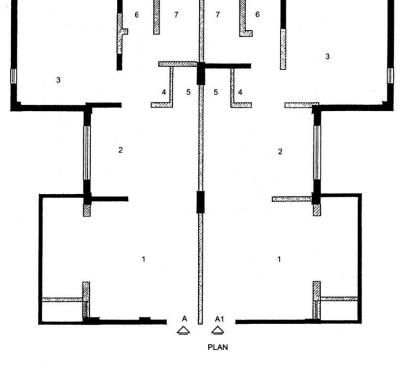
Interior Designing Details – Furniture Layout Plan
